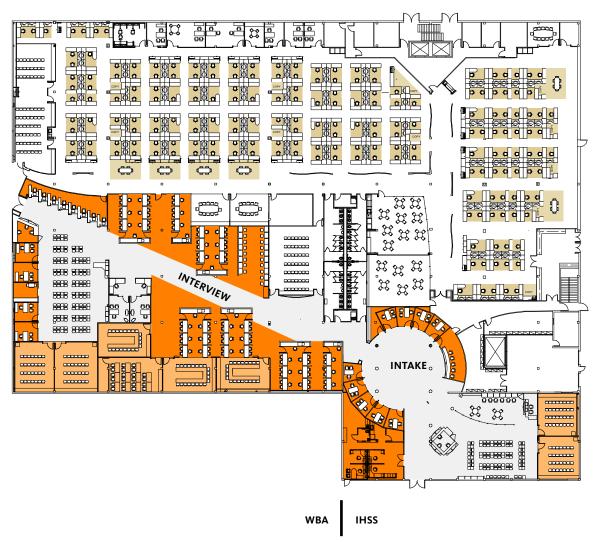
Test fit plan, Eastmont Town Center (6955 Foothill Ave), Floor 1
